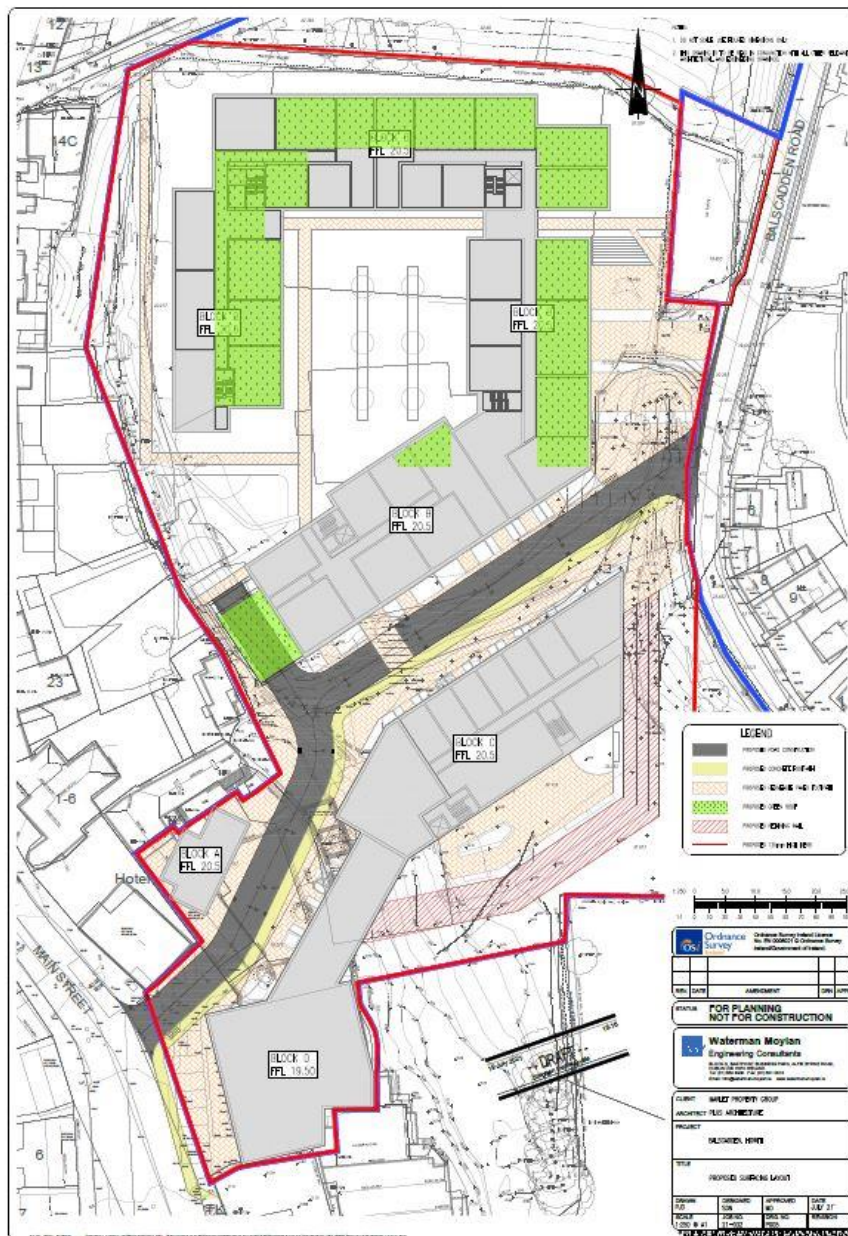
Proposed surfacing layout (Waterman Moylan, 2021)
